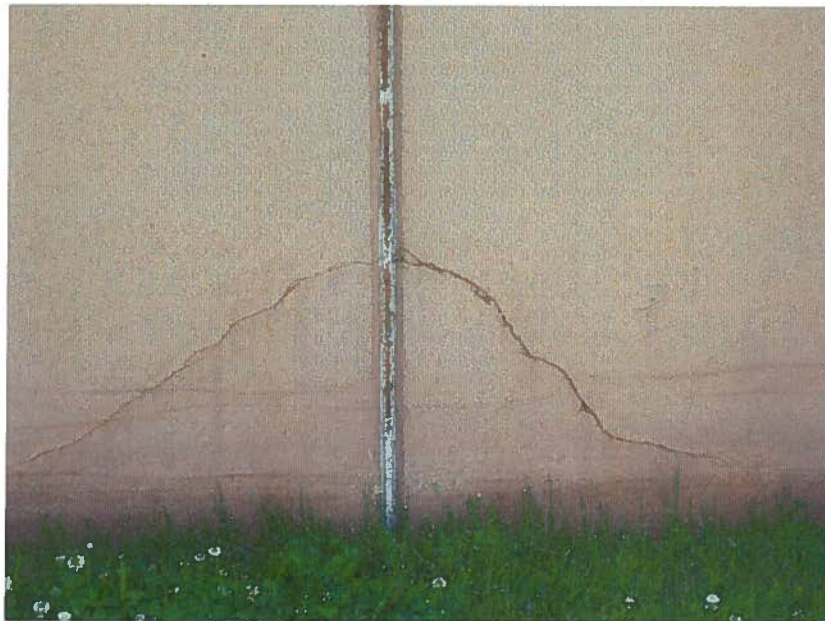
Aligned cracks at panel corners (Brenner photo)
